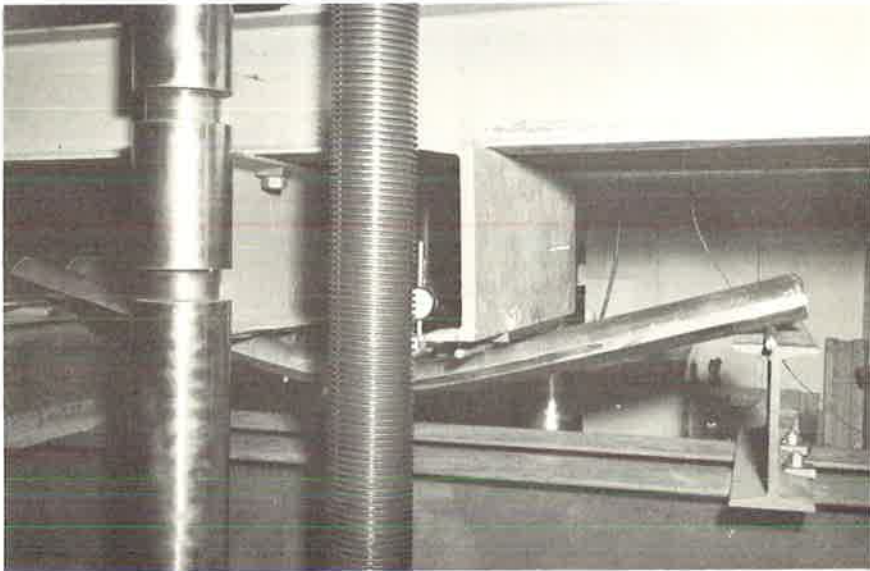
Beam test set-up. Bolted splice is behind screw column.
